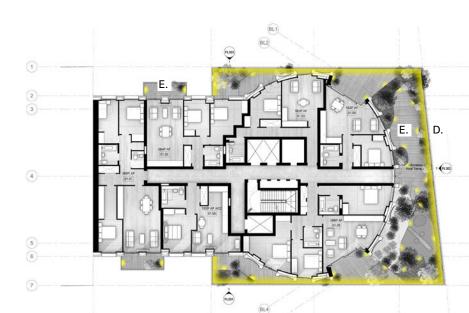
First Floor Plan indicating external lighting elements
